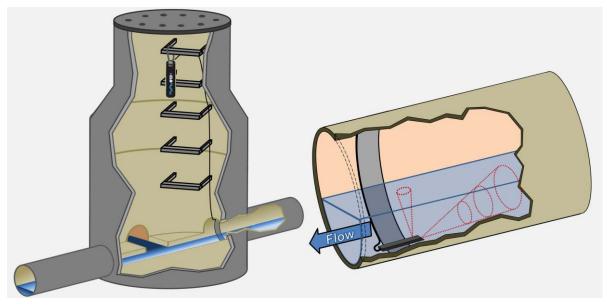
Typical Installation for Flow Meter with Submerged Sensor
